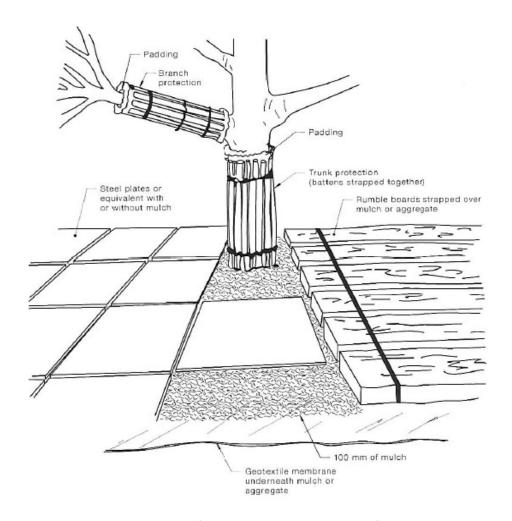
showing the proposed fencing that is to be put in place before the commencement of building works on site (Trees 1 & 2 only). Source: Australian Standards 4970 - 2009
